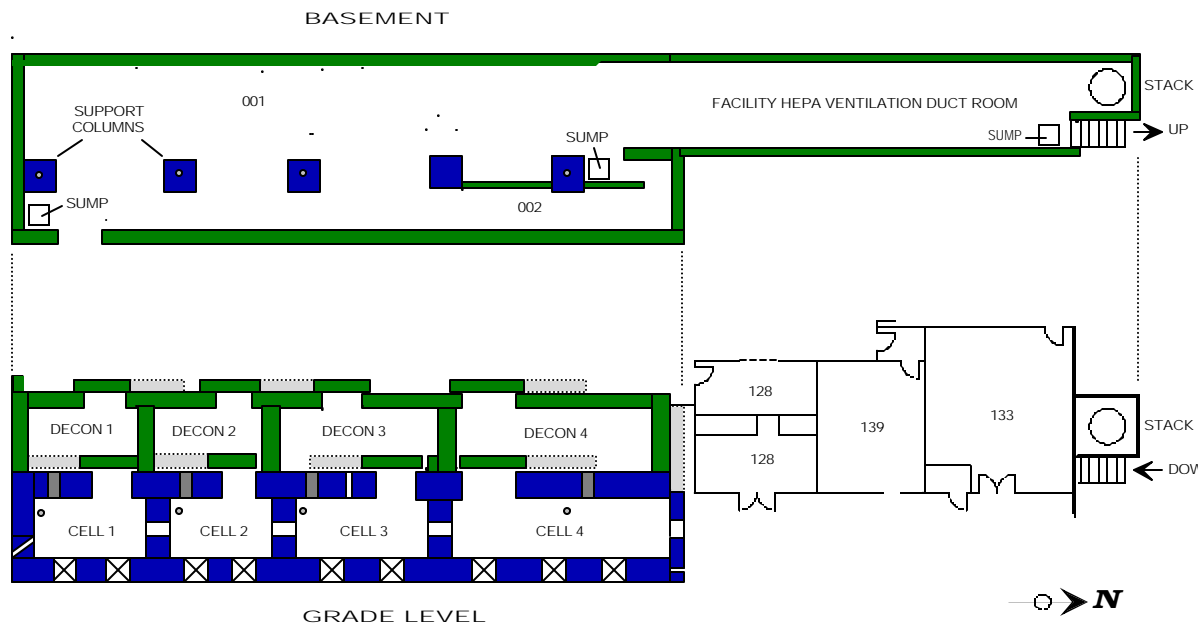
Plan View of the Building 4020 Basement, Shown Relative to the Hot Cells and Decon Room.
